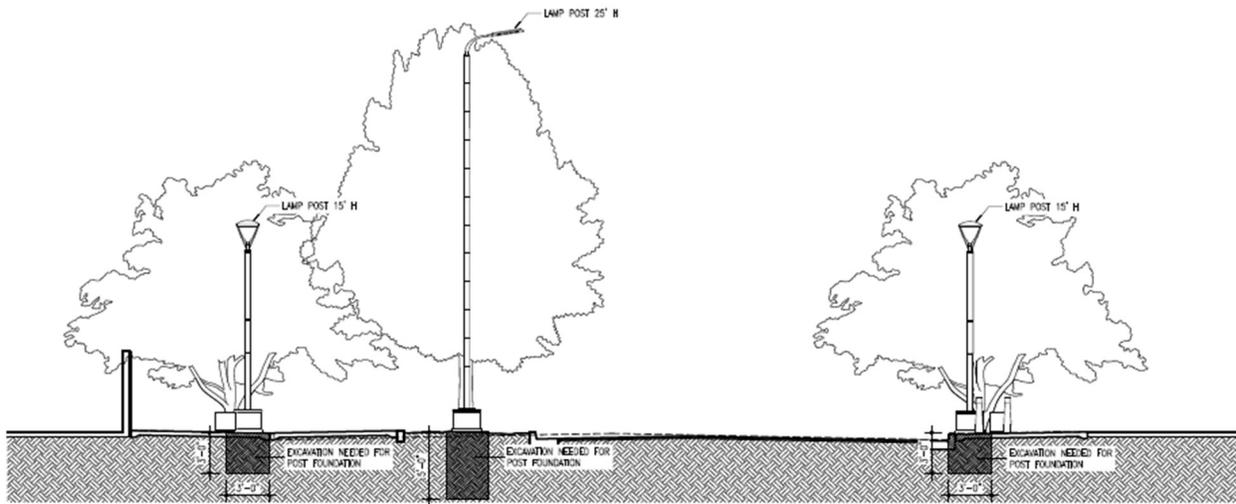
Detail of Lamp Posts impact on soil– ROSSILUGO
